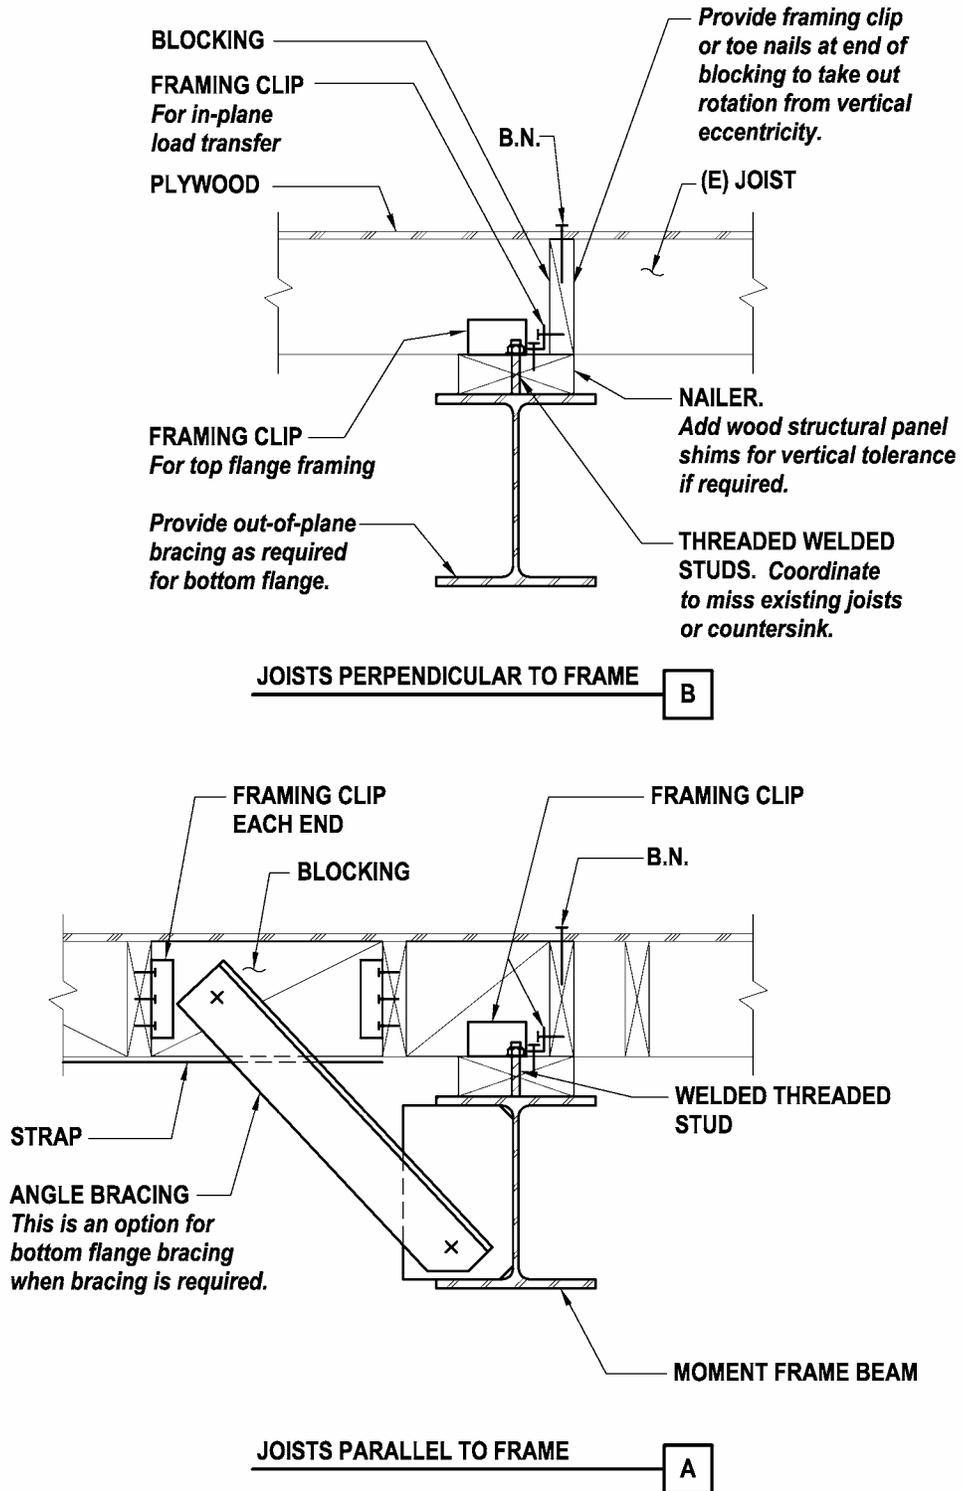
New Interior Steel Moment Frame to an Existing Wood Floor
